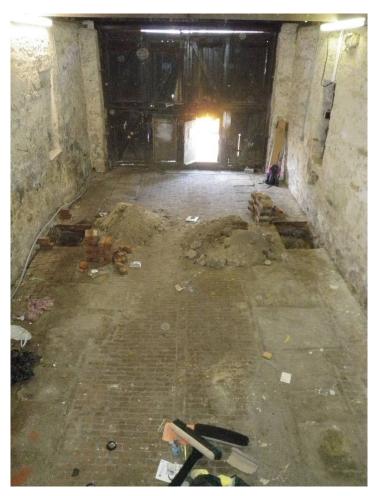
Interior of Building 1 (former lifeboat station) looking north showing original brick floor with granite wheel runs
